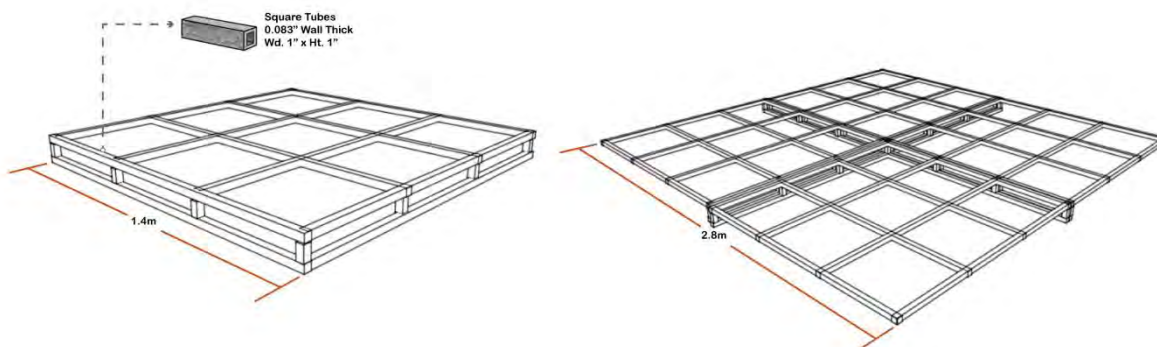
Steel Structural Frame Design Drawing. Use two layers of steel on the sides where one module will be attached to another module
